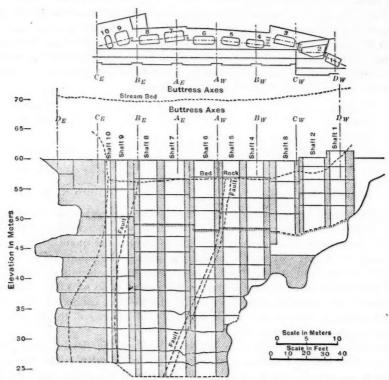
CUT-OFF WALL, PLAN AND LONGITUDINAL SECTION AT RIVER CHANNEL,
